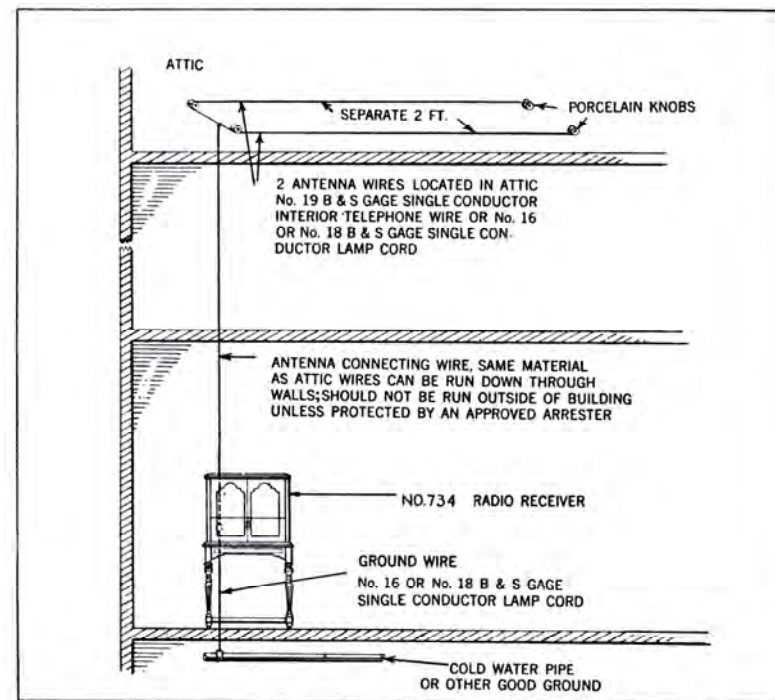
Attic Antenna. Used where the roof of the building is not covered with metalwork.
